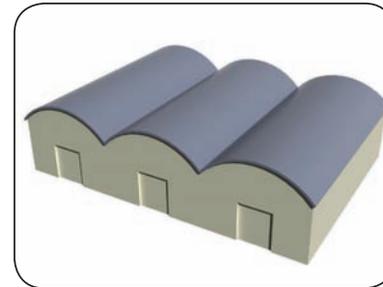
'Roof Form in Series' Best Practices – Chow Low Hammond Architects
